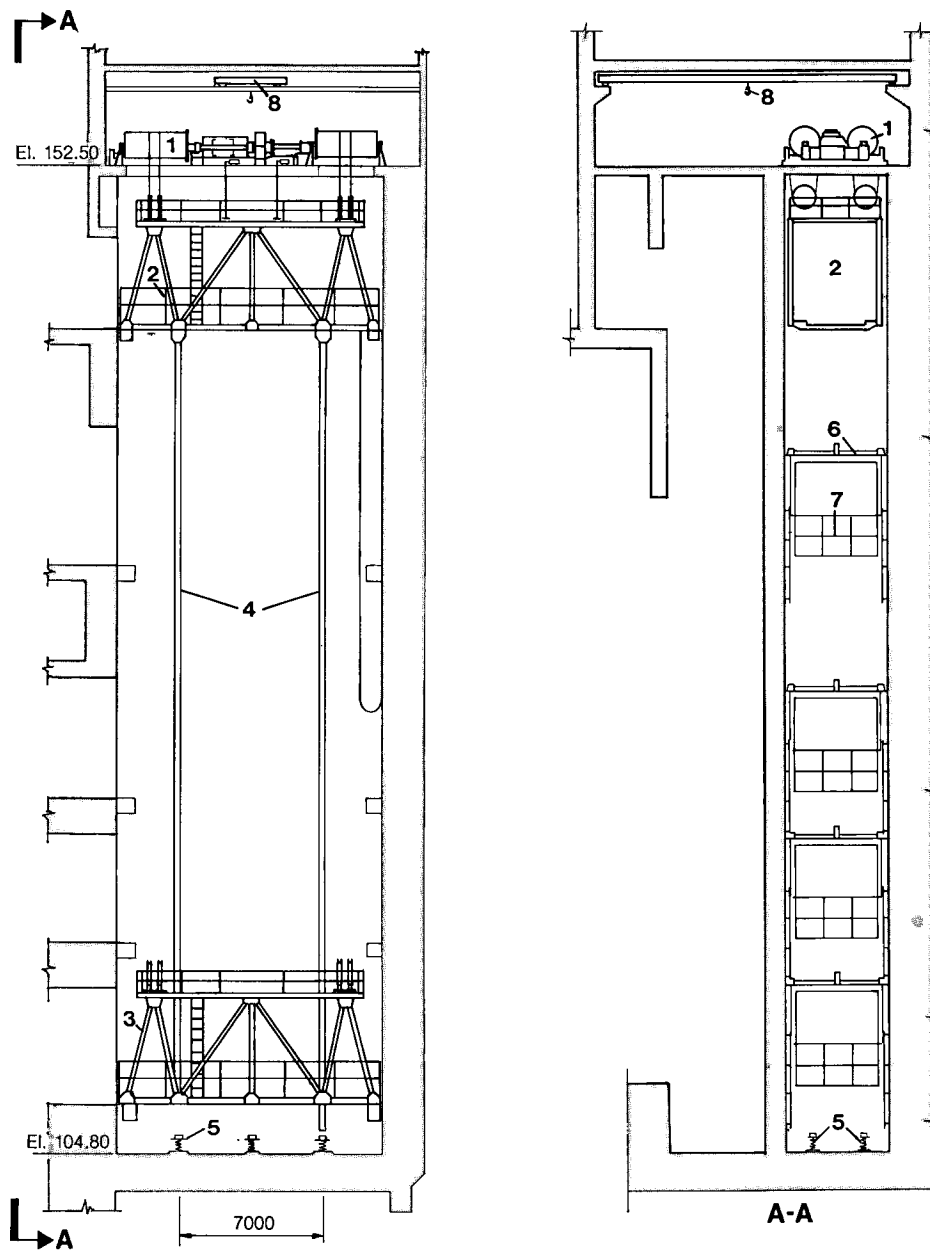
General arrangement of cargo elevator - central assembly area
